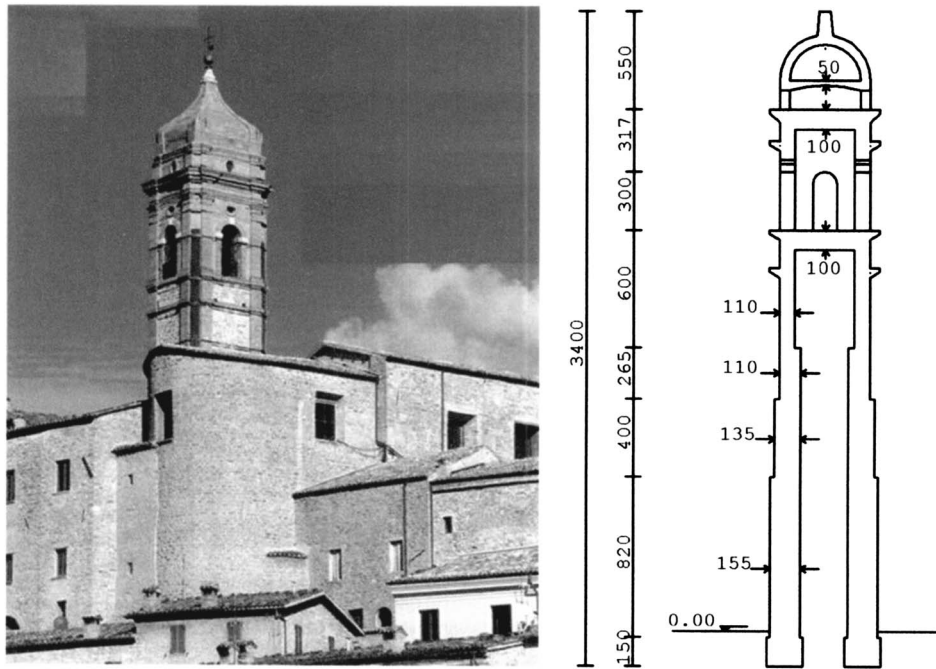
Bell tower in Serra San Quirico after intervention and its longitudinal section (all measures in cm)
